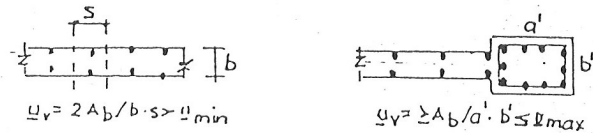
DEFINITION OF VERTICAL REINFORCEMENT RATIO
